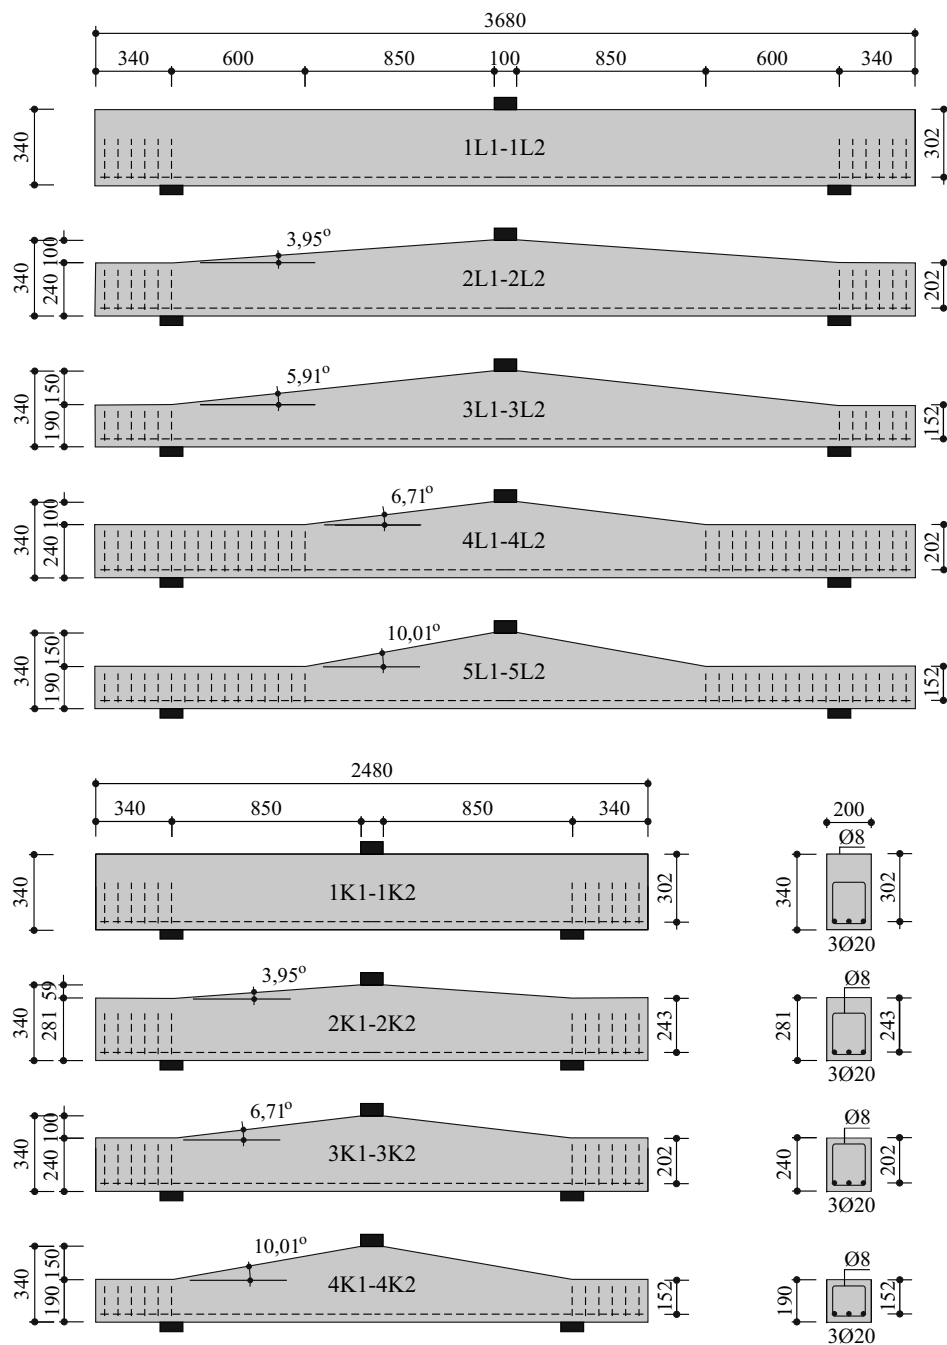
Geometrical dimensions of 18 (2x9) test beams
